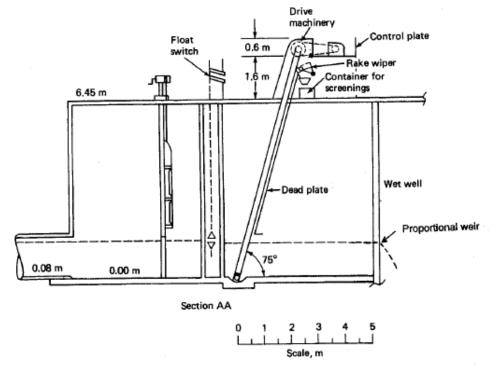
Design Details of Bar Rack. All Elevations Are with Respect to the Datum at the Floor of the Rack Chamber.
